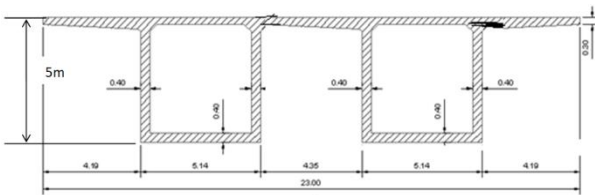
Actual cross section at the root of cantilever-Burri Bridge
